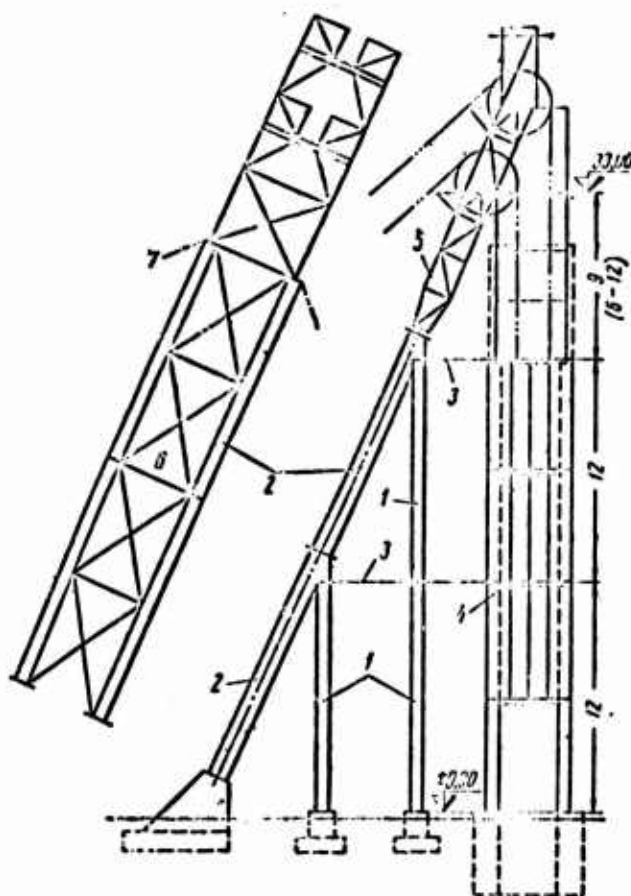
The diagram of a boom-upright of a sectional ferroconcrete pile driver.
